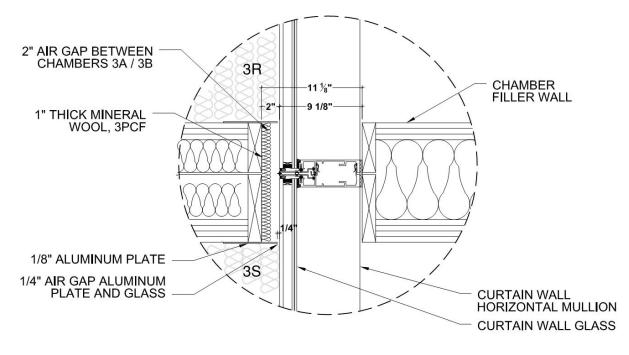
INTERSECTION DETAIL AT THE WEAL FILLER WALL AND THE CURTAIN WALL BAY
